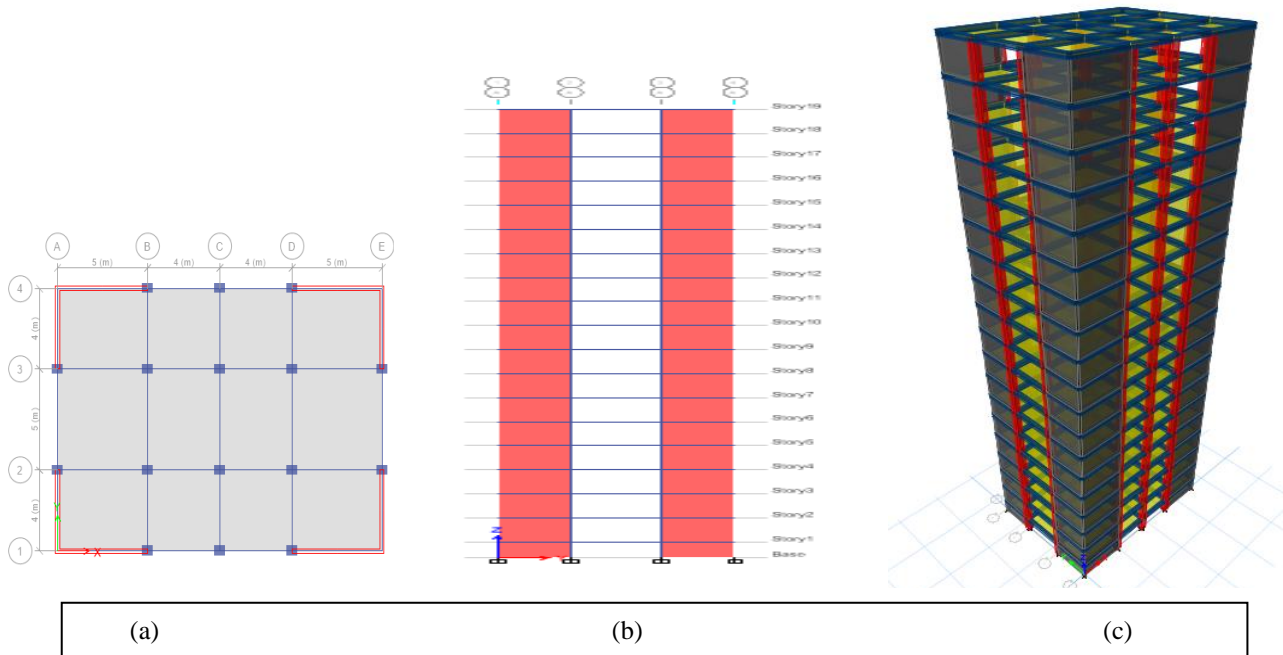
Plan of high rise building with shear wall(a), Elevation of high rise building with shear wall(b), Three dimensional view of high rise building with shear wall(c)
